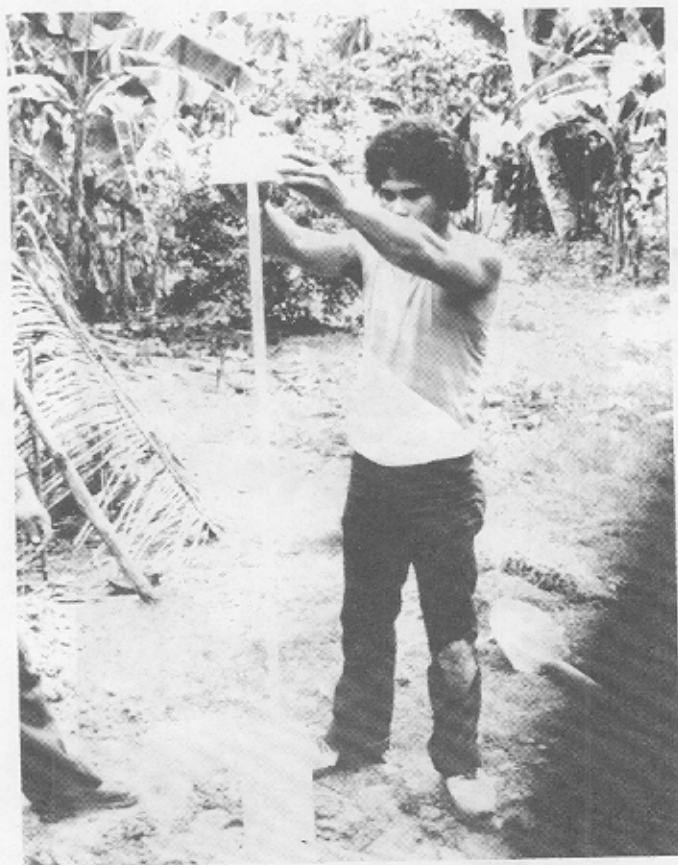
Removing the well pipe/pump assembly. Lift up the well cap and remove the well pipe/pump assembly from the well casing.
